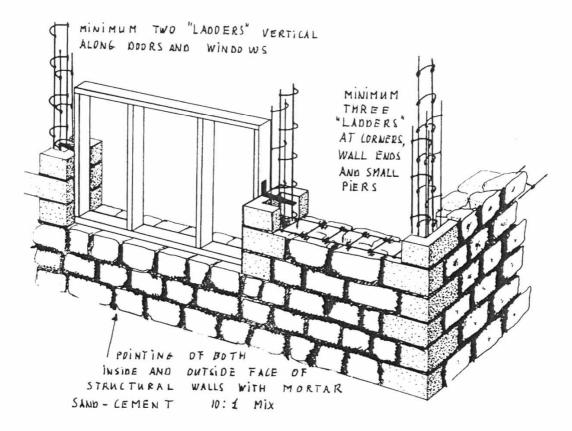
DETAILS OF "LADDERS" IN WALL SECTION WITH WINDOW AND NORMAL PIER
